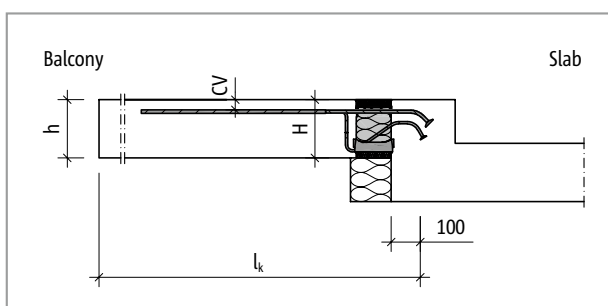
Schöck Isokorb® XT type K-O: Static system
